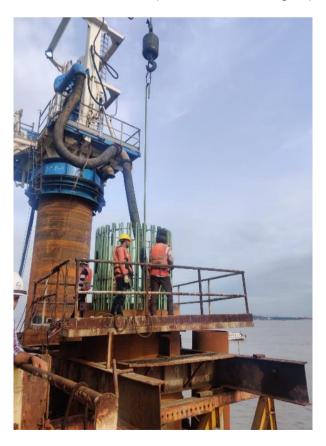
MP 126 N2 Top Cage Welding - Marine Area in progress
